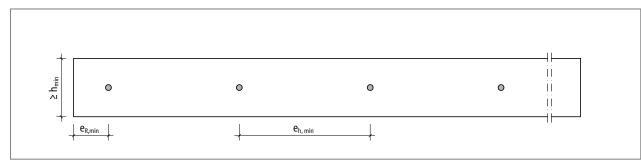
Schöck Dorn type LD: Minimum structural component dimensions and dowel spacings for a slab
